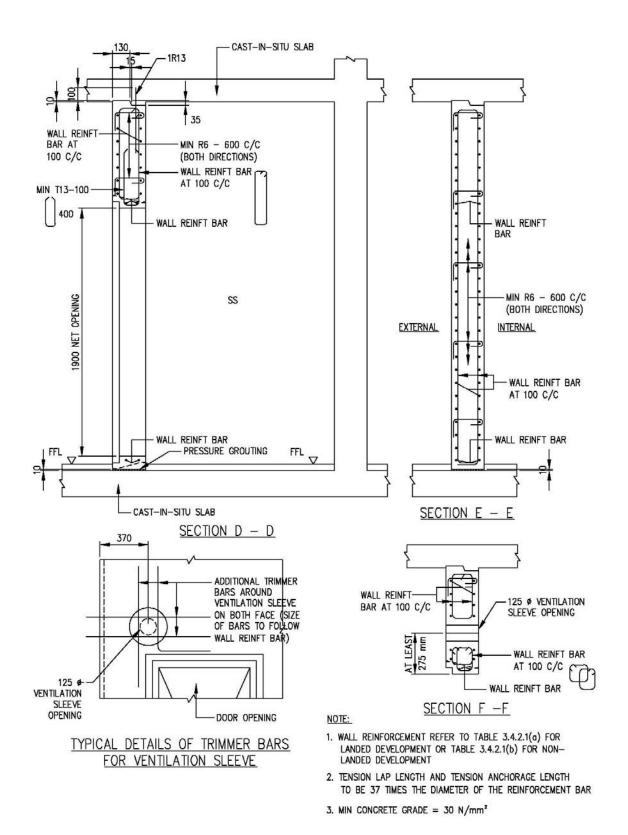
(d) DETAILS AND SECTIONS OF PRECAST SS DOOR FRAME WITH VENTILATION SLEEVE ALONG ITS SIDE (TYPE 1)
